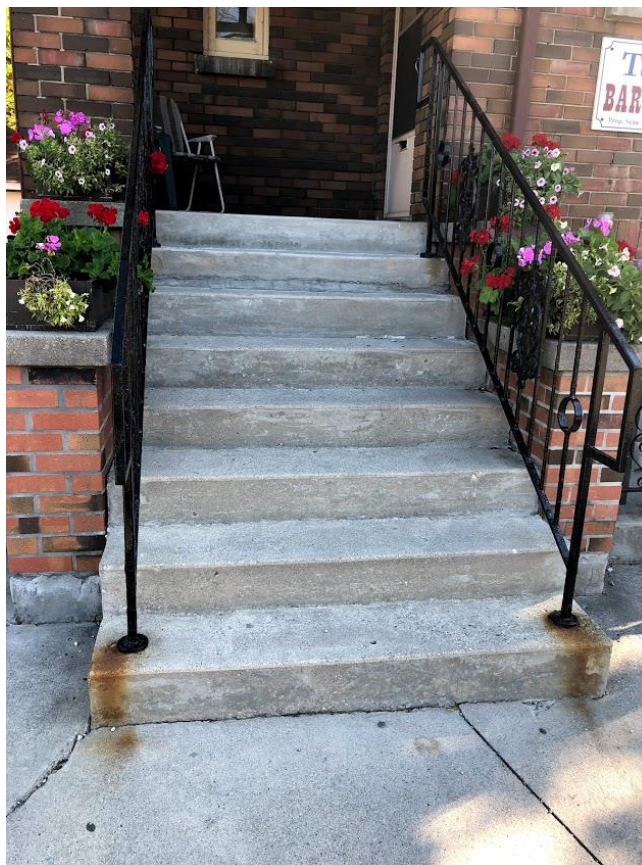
View of stairs to front porch on front elevation of the building located at 1110 Richmond Street
